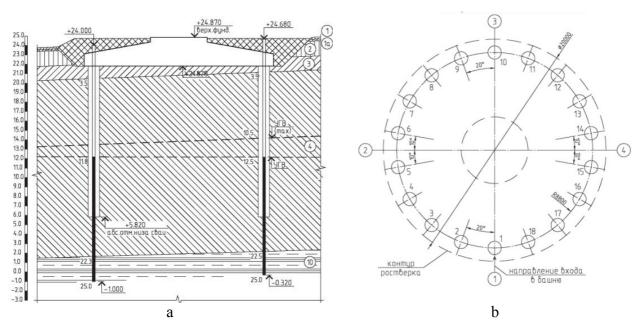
The area of construction of wind electrical installation: a – sectional elevation; b– scheme of pile field
